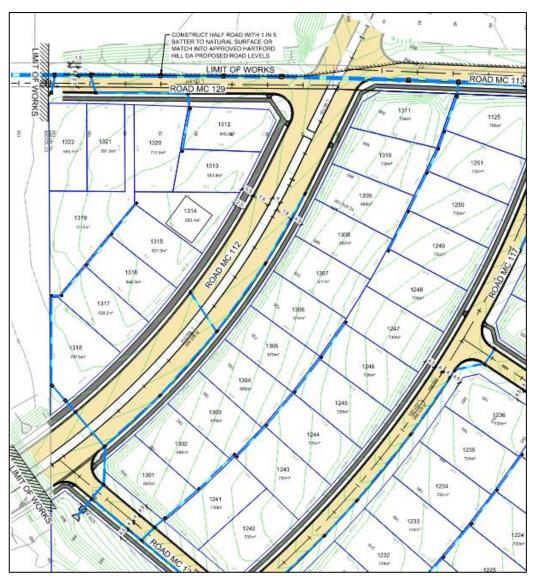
Extract of Proposed Road Layout and Lot Layout Modifications (Source, BRS: 2024
